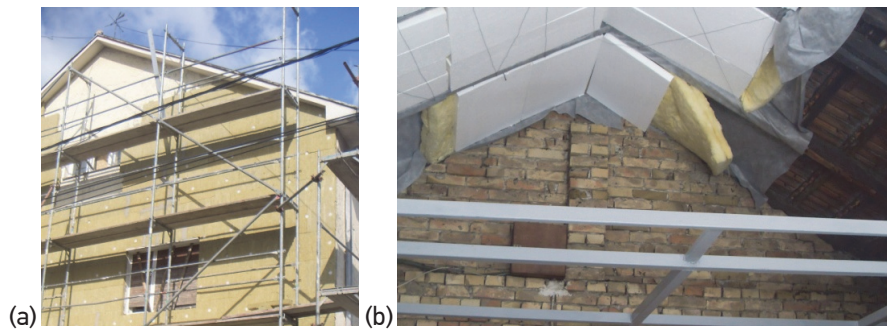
Details of contact facade construction(a) and roof insulation (b)
